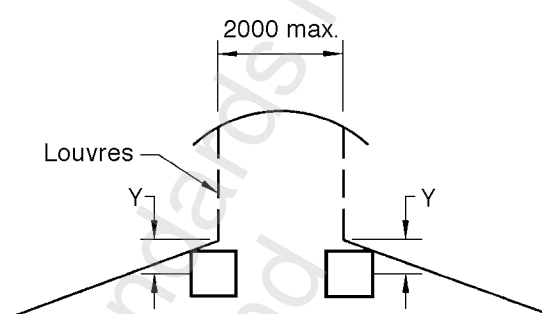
Typical detector locations at apex of ceiling, roof or surface (refer 405.2.1(f))
